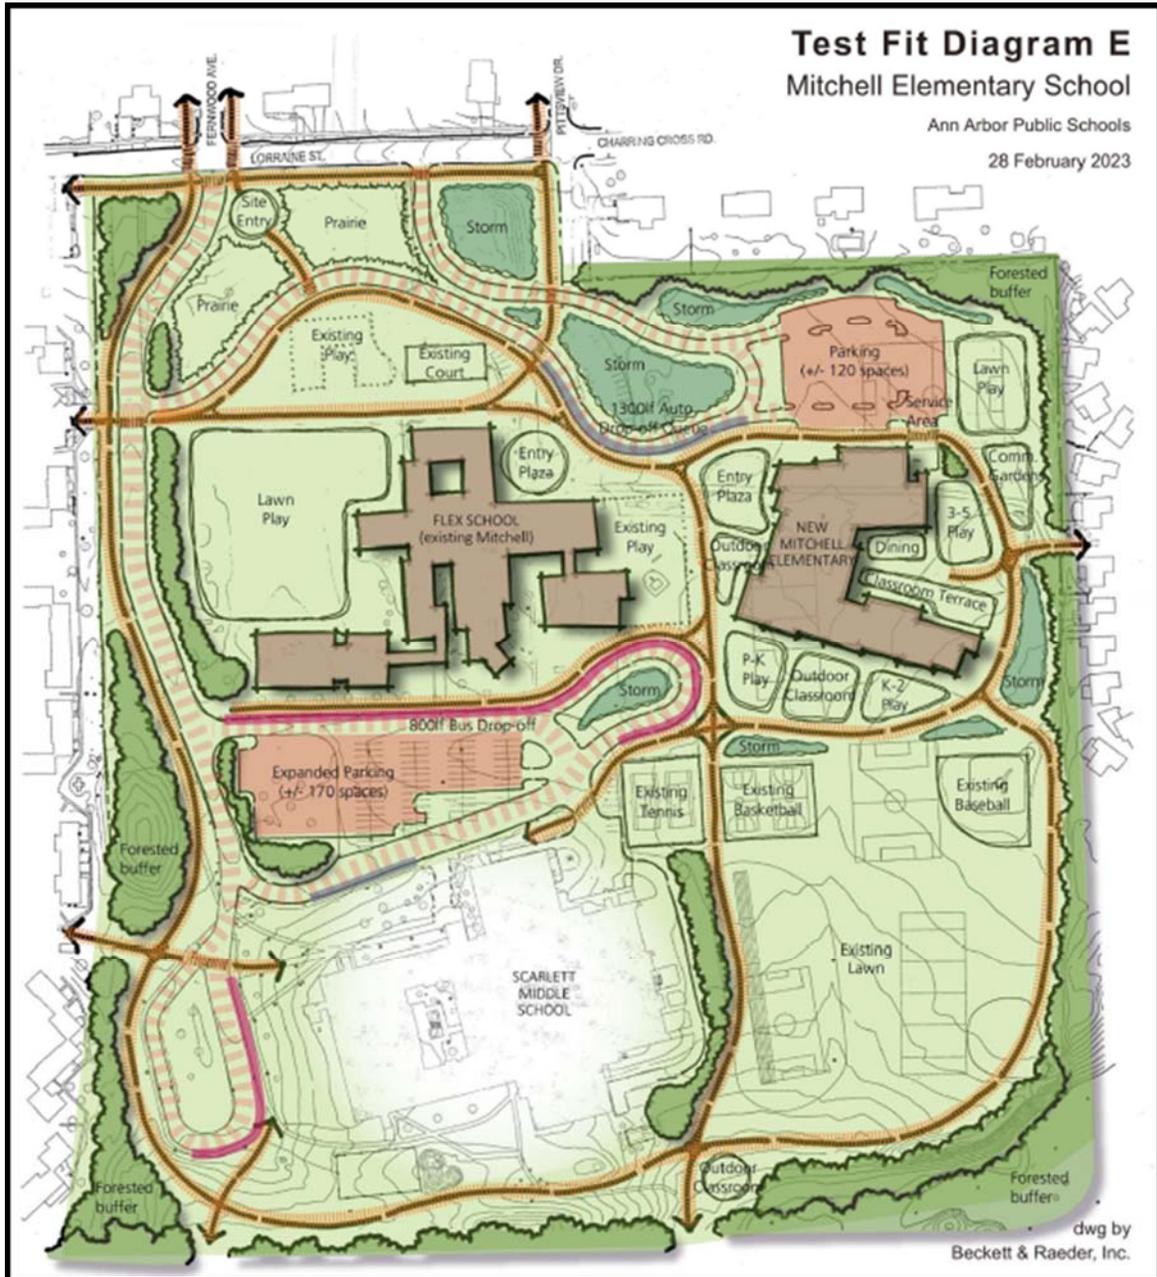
Test Fit Plan E– Scarlett/Mitchell Campus
